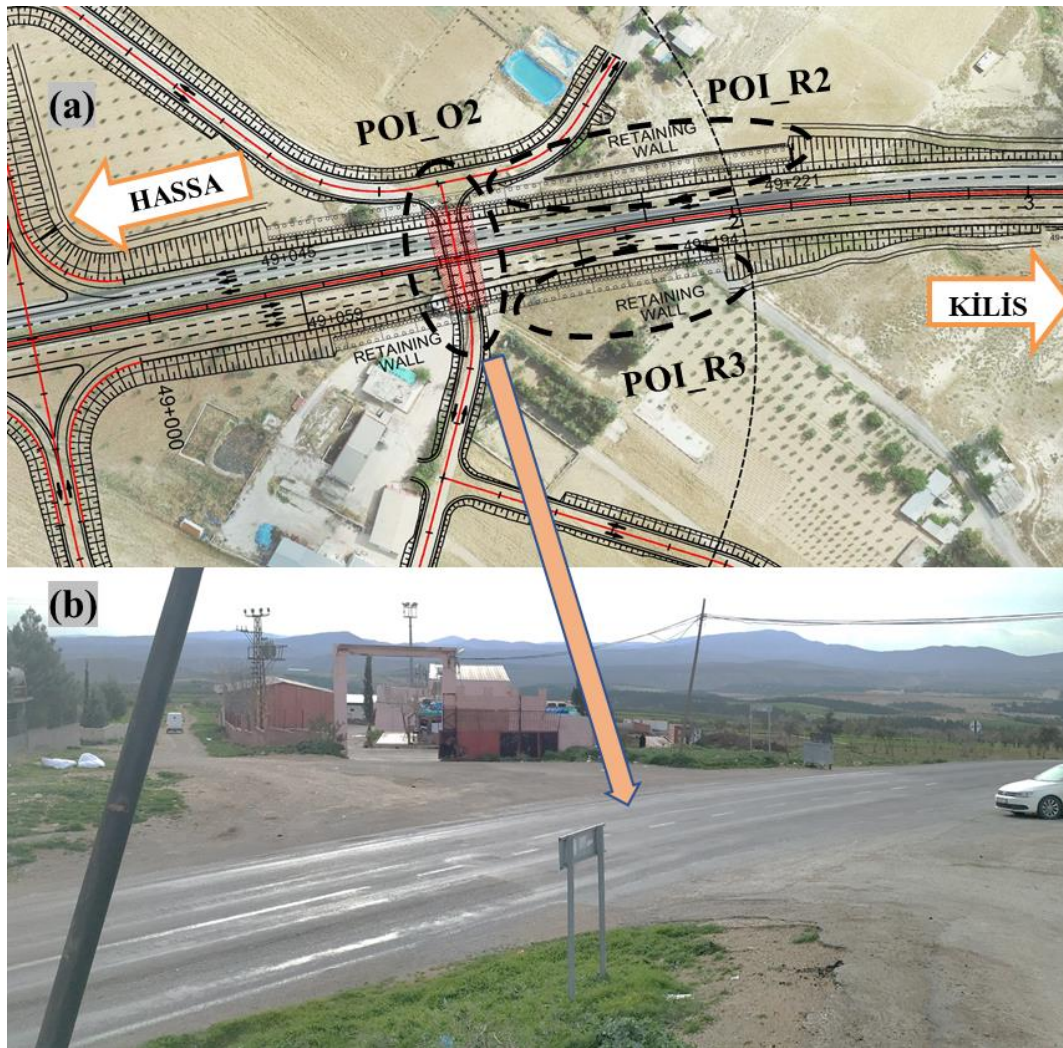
(a) POI_ O2, POI_R2, and POI_R3 at K-4 Beşenli Junction area general layout at St. Km: 48+960.000 (b) a view of the existing situation at POI_O2 Overpass bridge location
